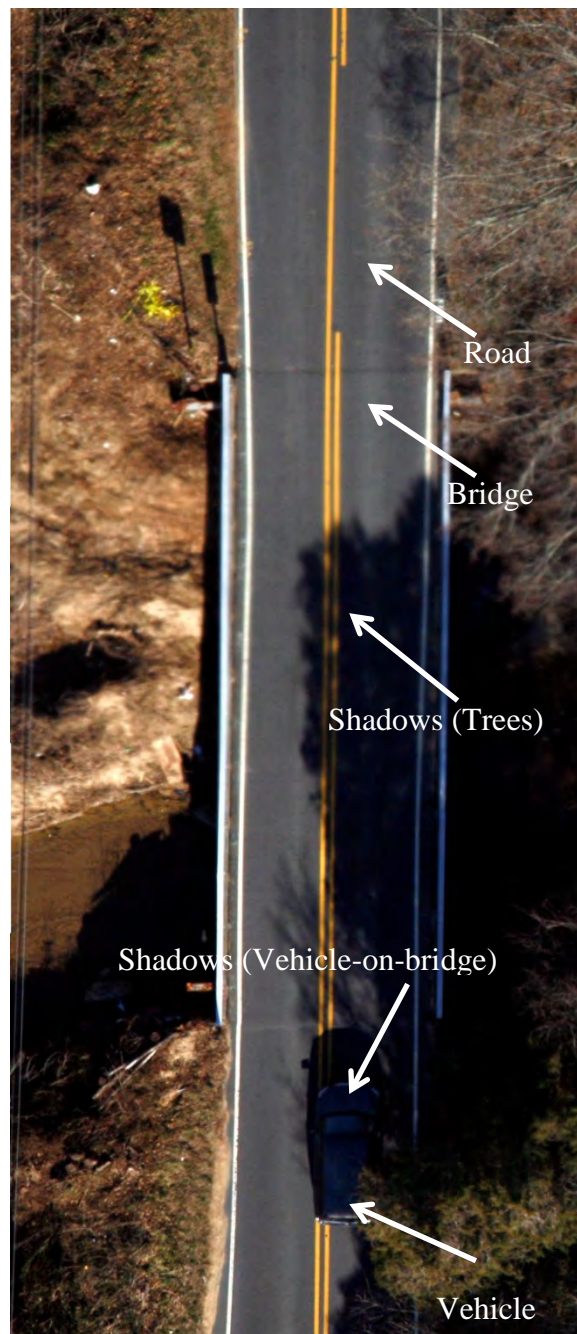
Aerial image of Reedy Creek Road where the road and bridge are undistinguishable.
